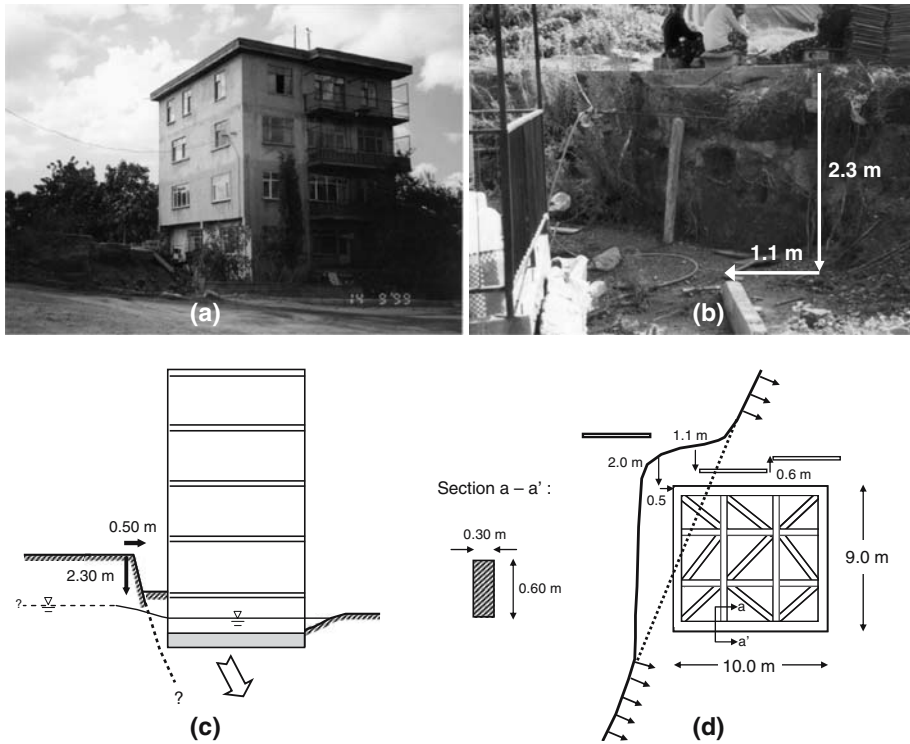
Building 1, four stories plus basement; Minor Damage: (a) photograph of the building showing the fault trace directed towards the building, before being diverted, (b) photograph showing the vertical displacement reaching 2.3 m, along with a horizontal component of 1.1 m measured on the torn apart fence of the building, (c) cross-section of the building, and (d) plan view of the foundation (box-type foundation with cross tie beams), along with the horizontal displacements measured around the building
